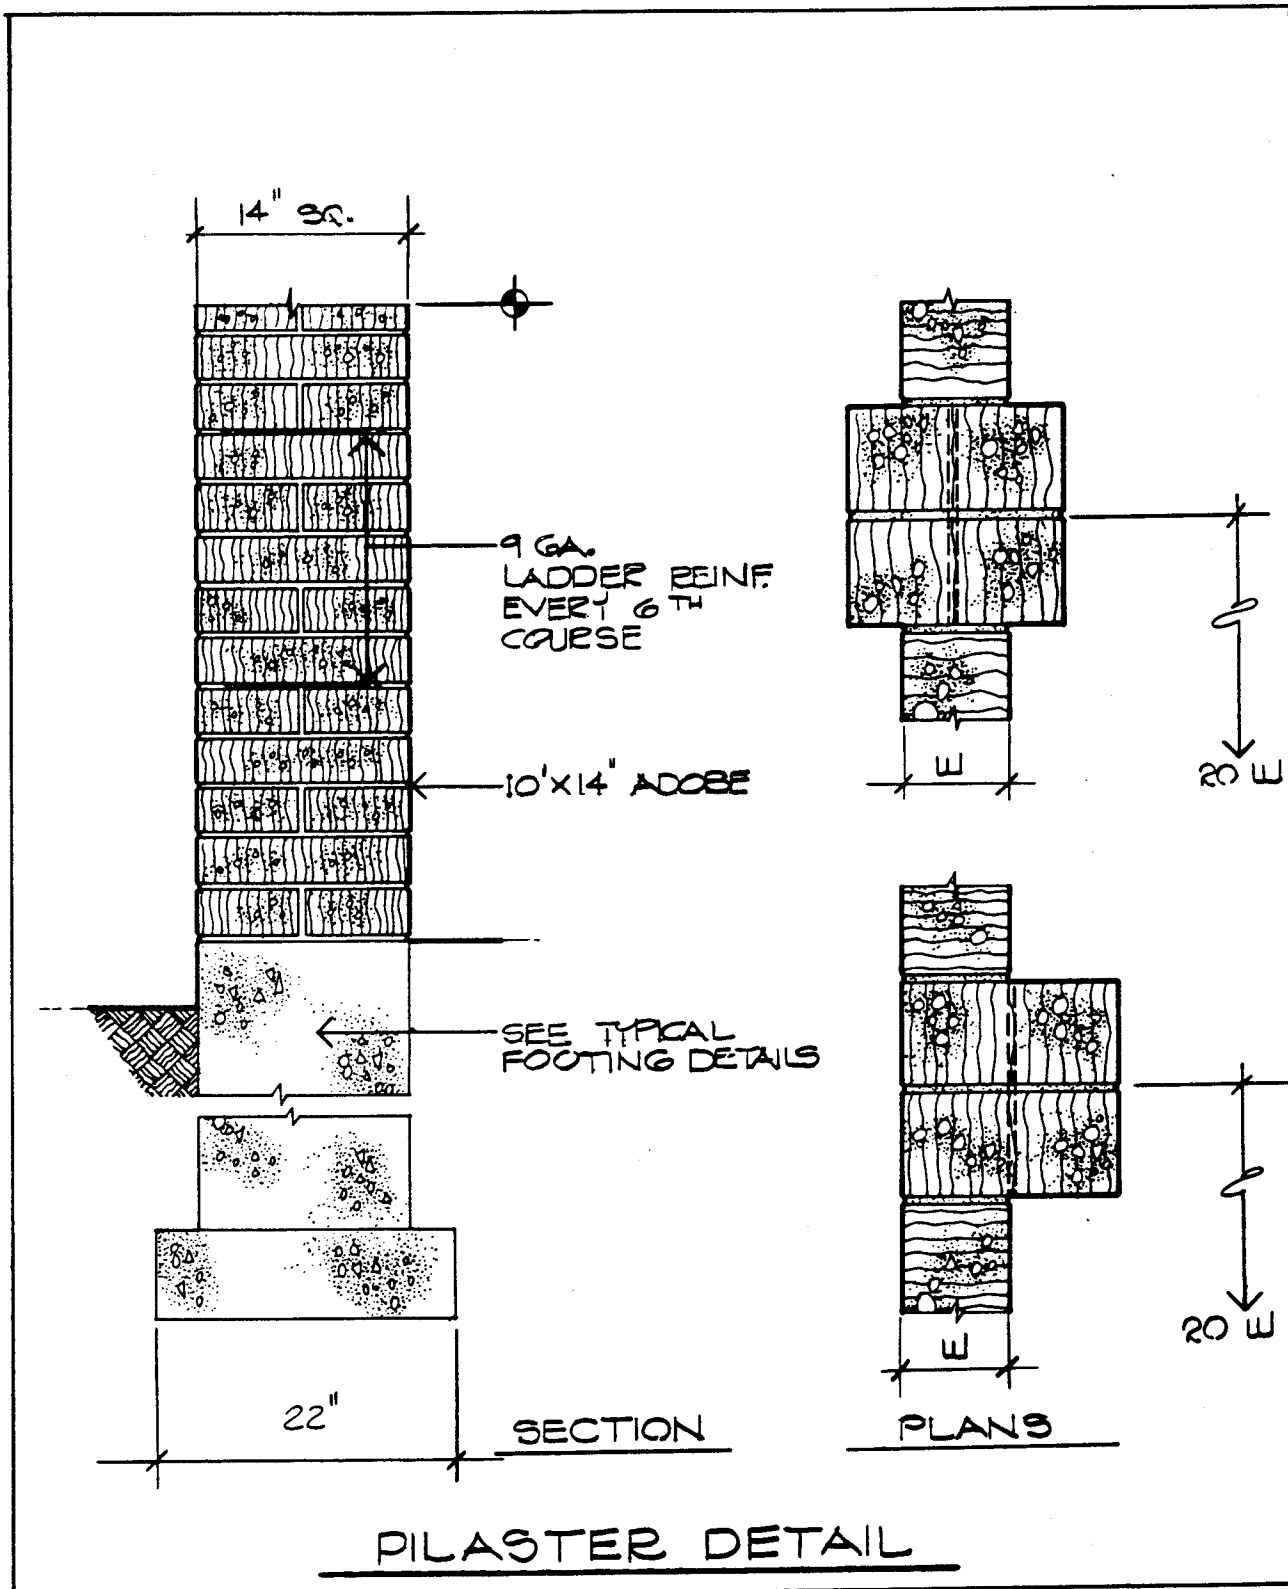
ADOBE POST OR PILASTER DETAIL.
